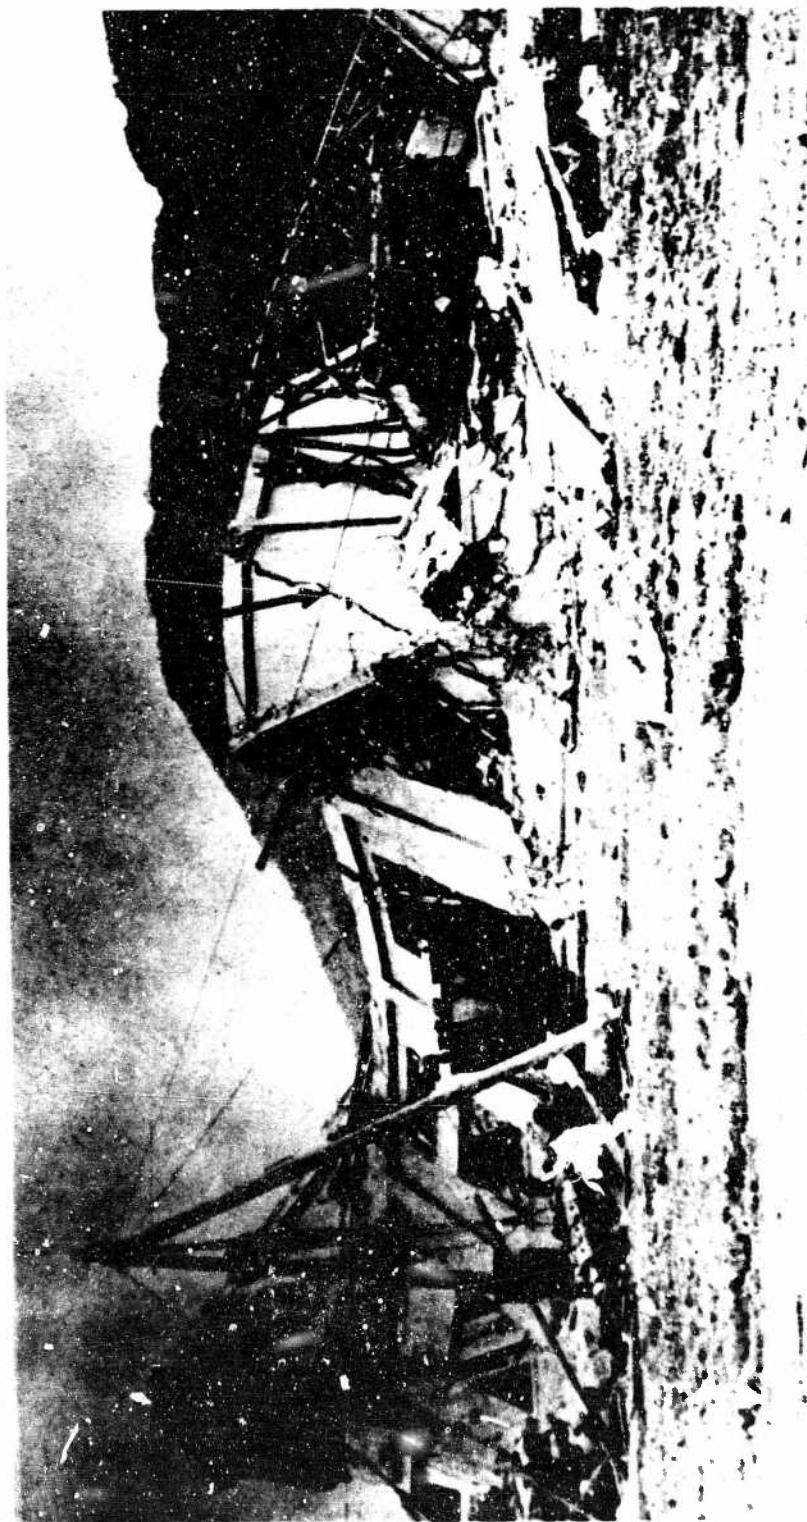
ONE STORY R/C BUILDING WITH SHEET ROOF TRUSSES LOCATED 0.26 MI FROM GROUND ZERO AT NAGASAKI
